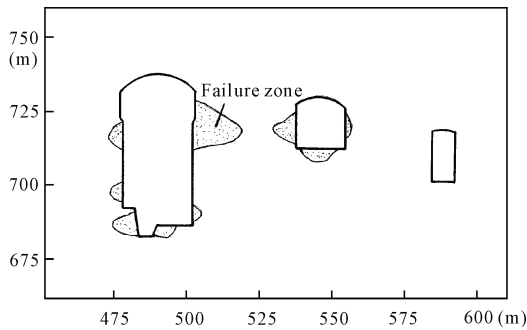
Failure zone of surrounding rock (*B-B* section)
